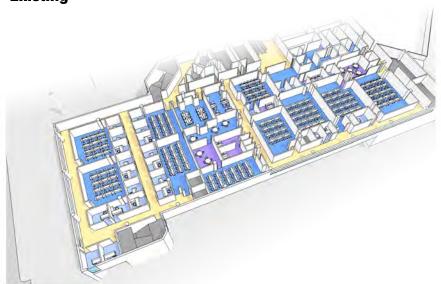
Typical layout of existing classrooms, faculty offices and meeting rooms
